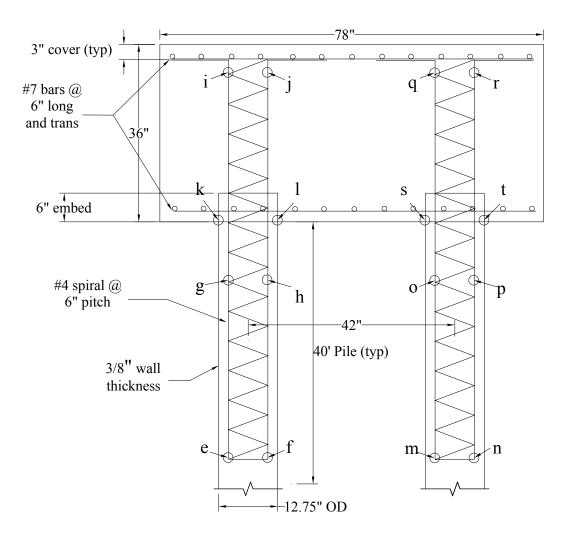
Pile Cap 1 with construction details and instrumentation layout.
